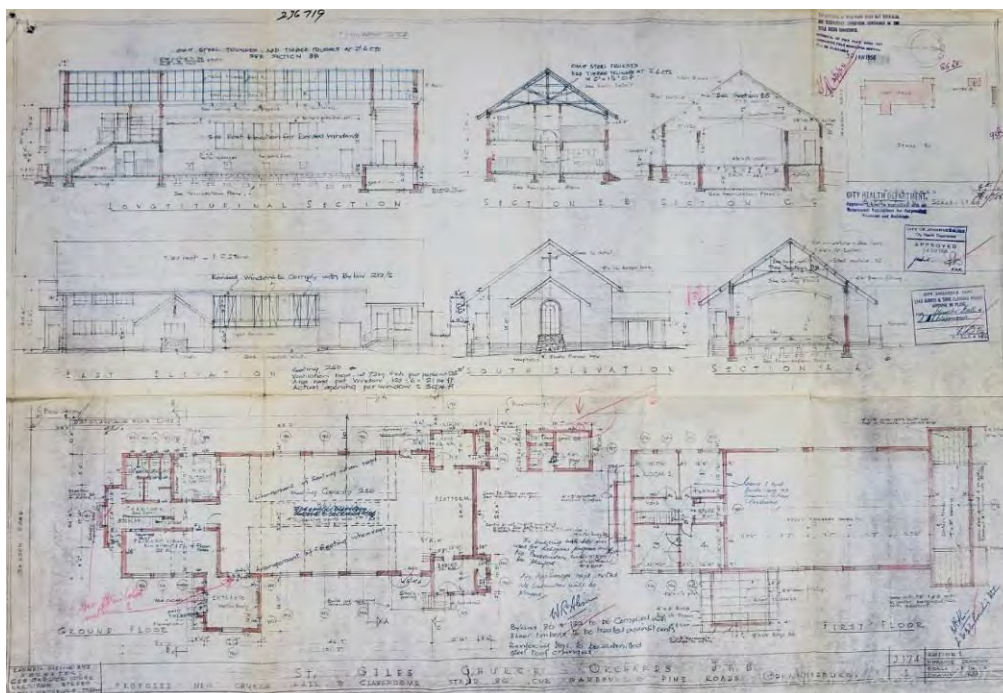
Plan for proposed St. Giles new church, hall and classrooms
